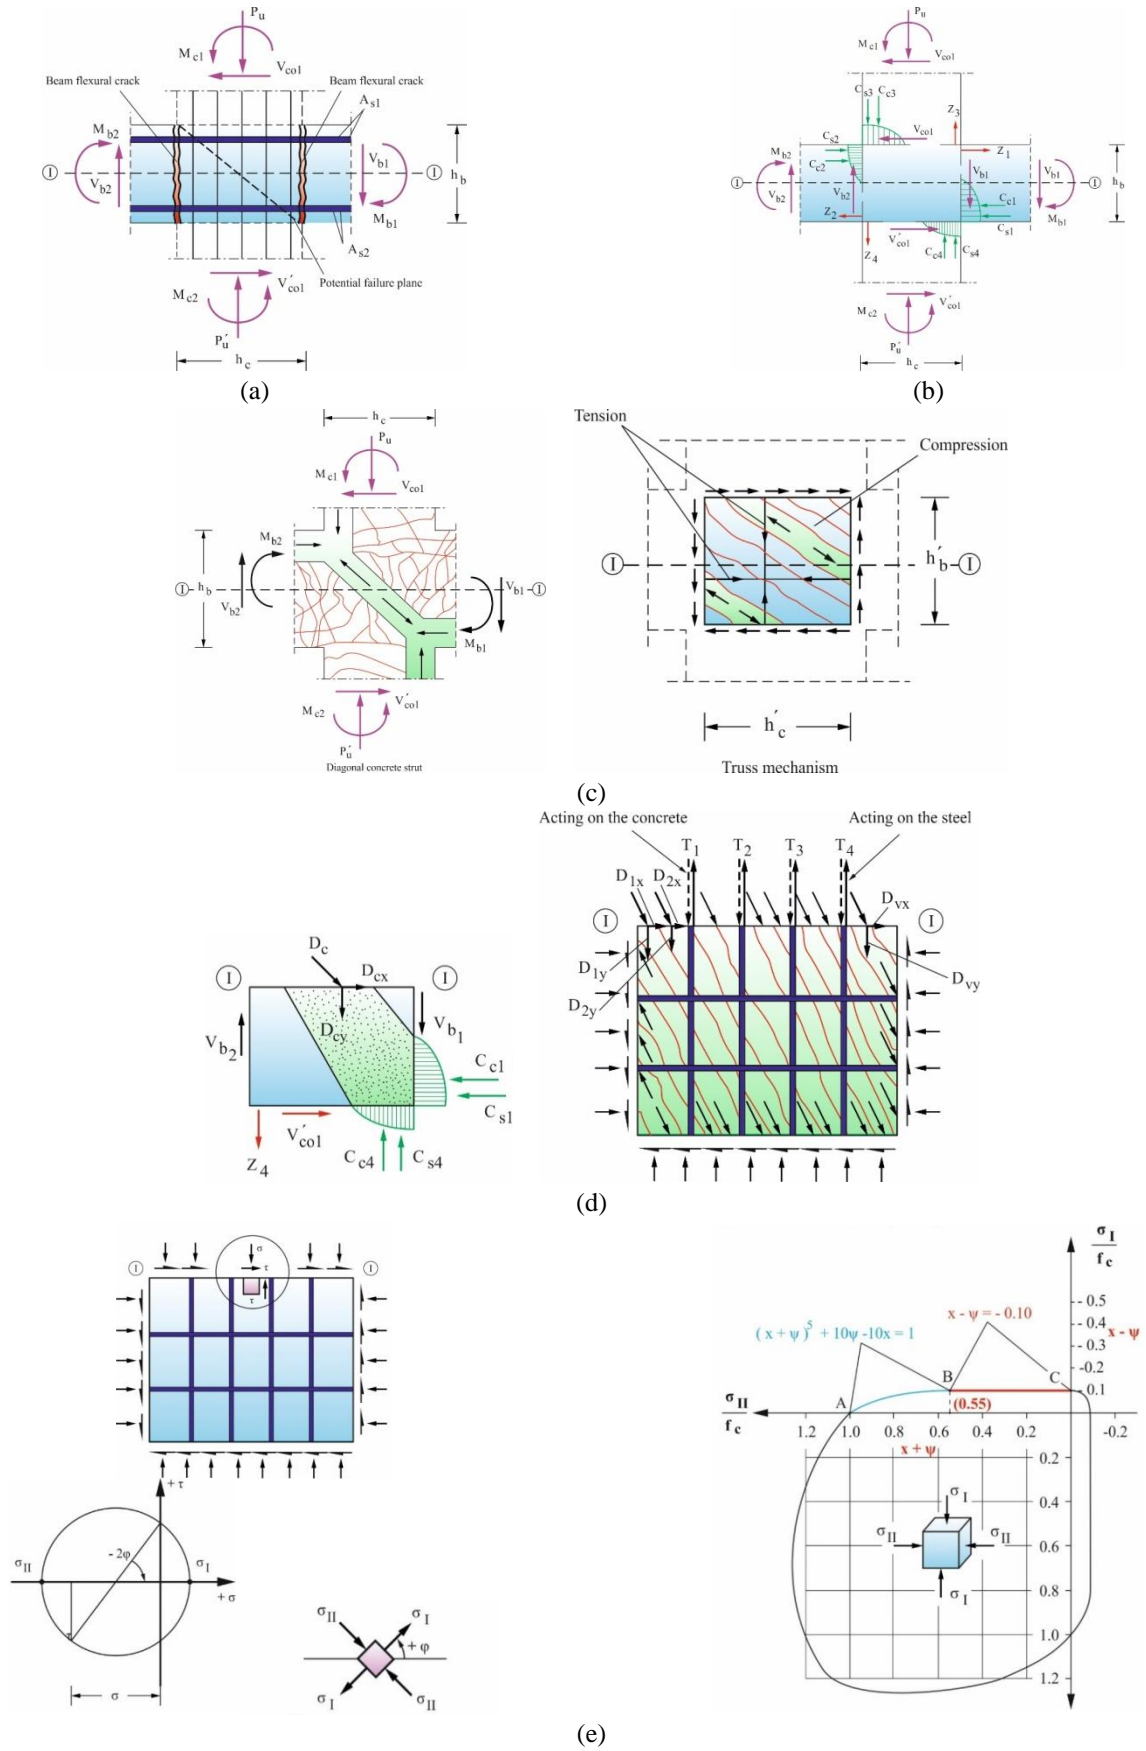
(a) Interior beam-column joint, (b) Internal forces around an Interior beam-column joint as a result of seismic actions, (c) The two mechanisms of shear transfer (diagonal concrete strut and truss mechanism), (d) Forces acting in the joint core concrete through section I – I from the two mechanisms, (e) Stress state element of studied region and representation of the concrete biaxial strength curve by a parabola of 5<sup>th</sup> degree (Tsonos 2007)
